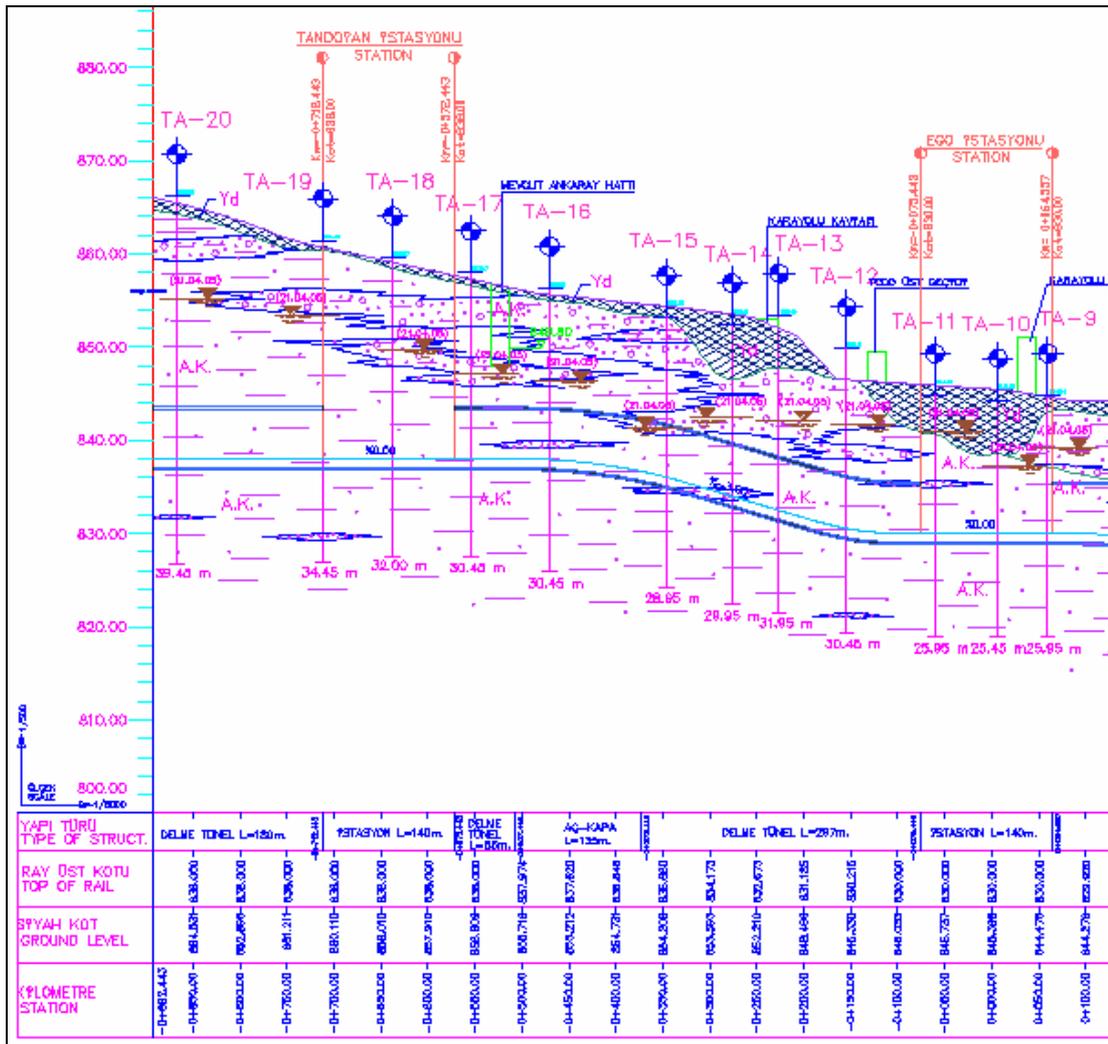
Segment of the metro alignment between Tandoğan and EGO stations
